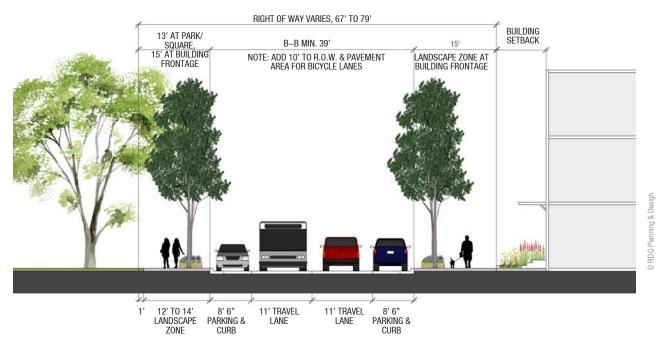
SECTION - LOCAL STREET, TYPE A
